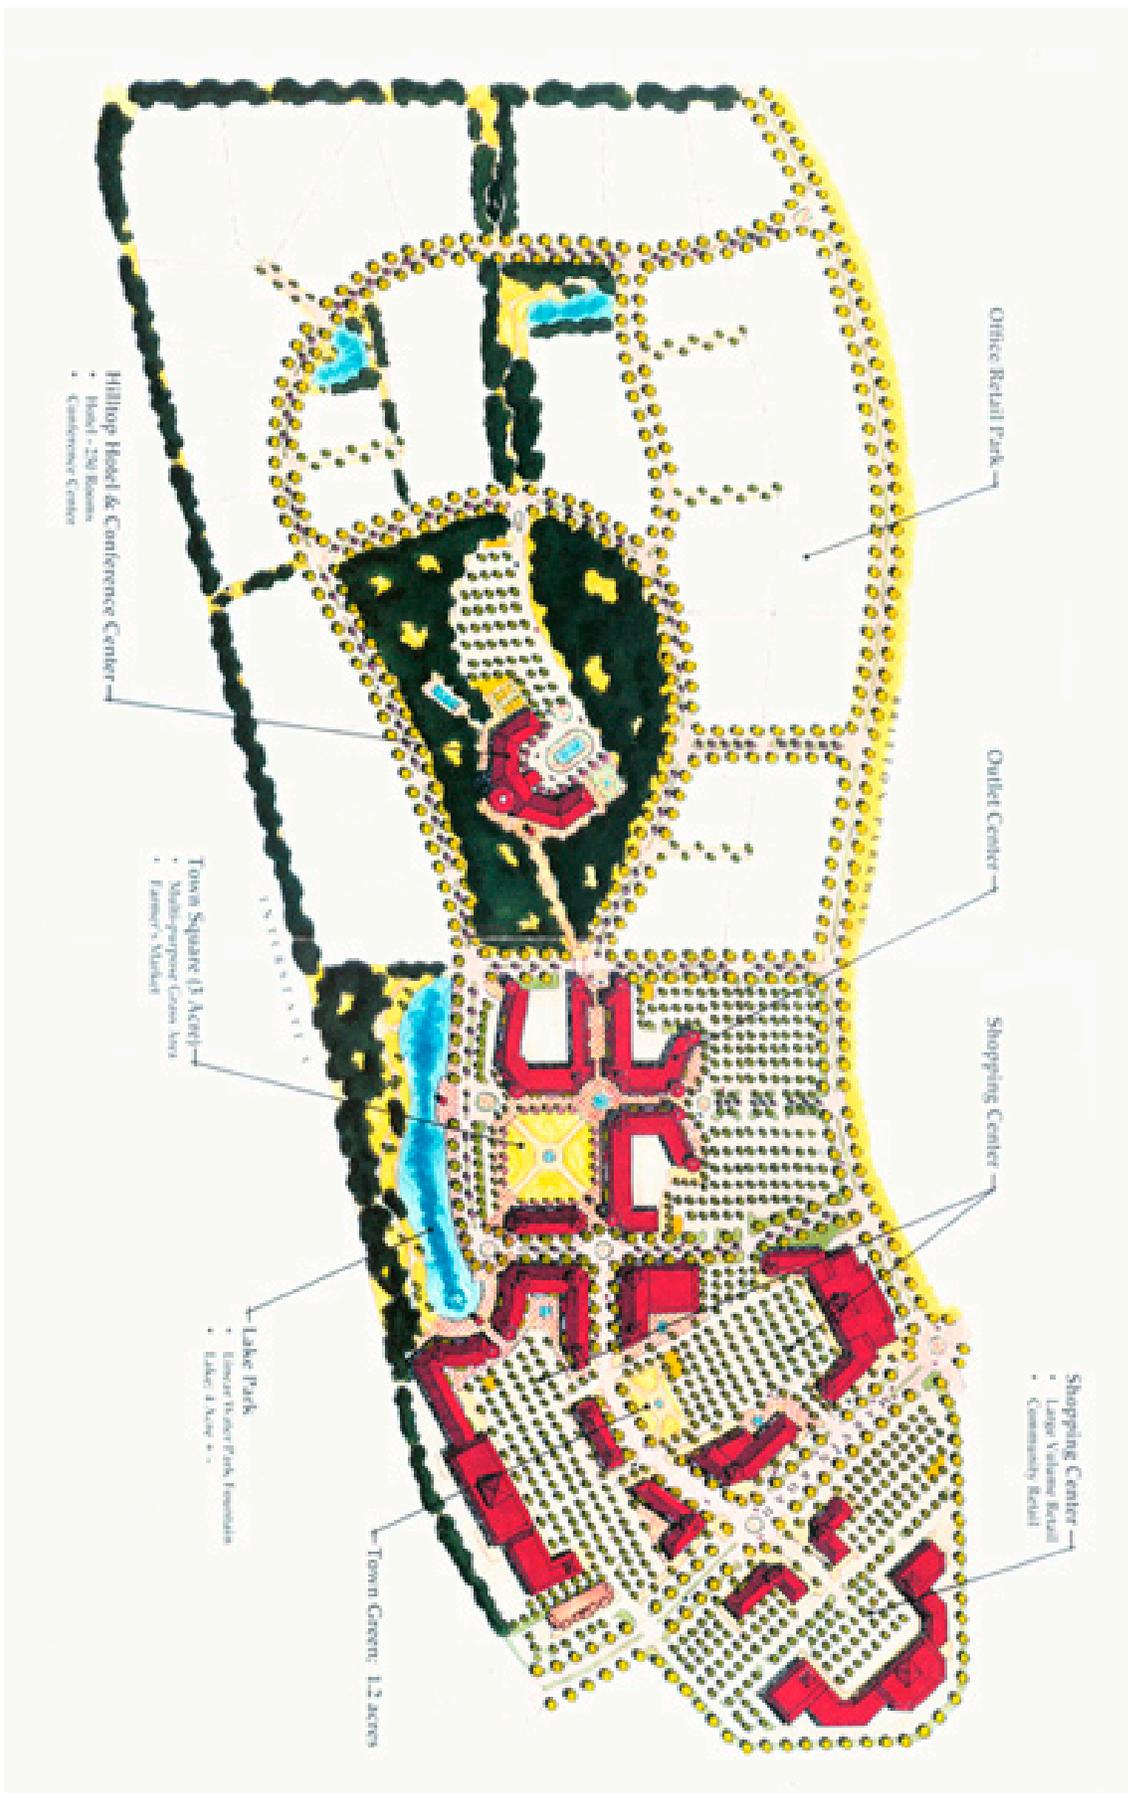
Freeman, Tung & Bottomley HPBD Concept Plan 1
